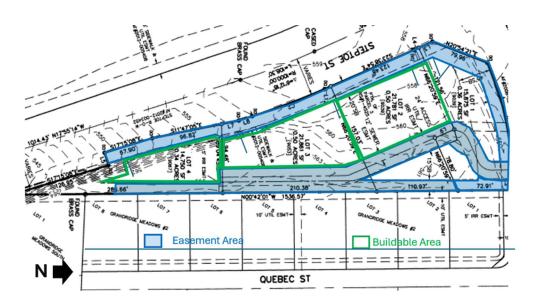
B: Buildable Area Under C-2 Zoning Setbacks
